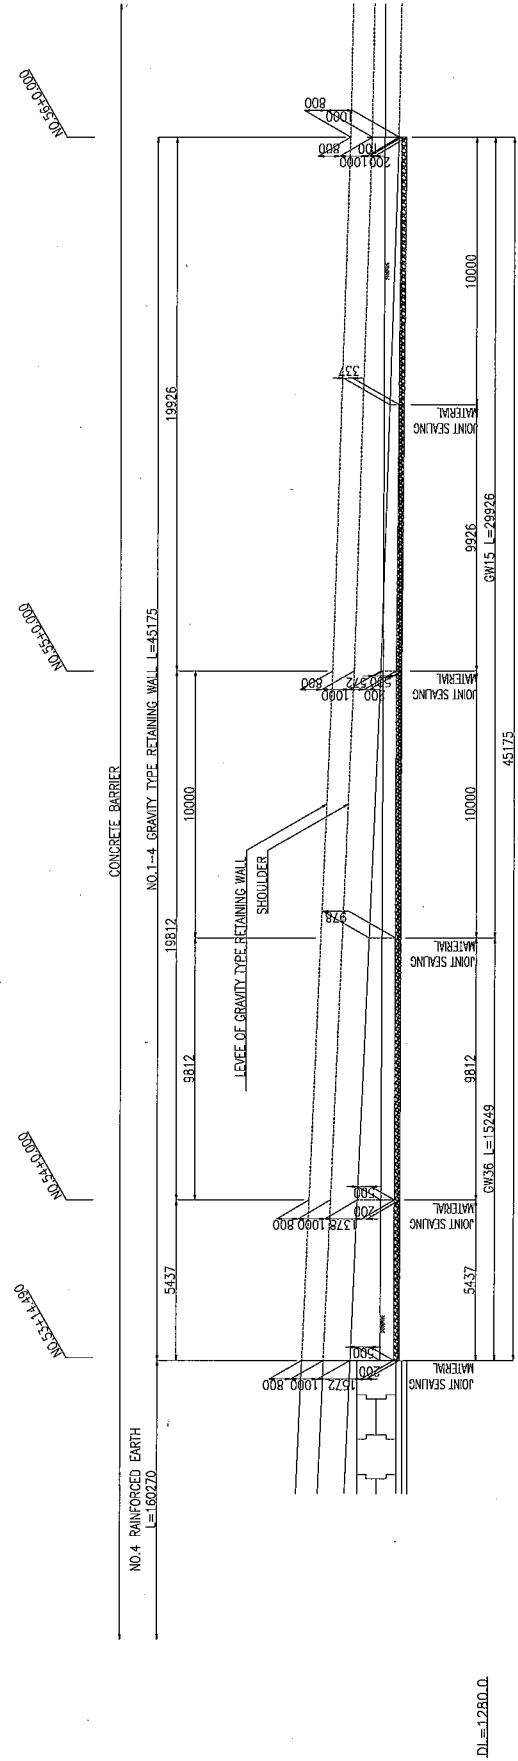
DETAIL OF GRAVITY TYPE RETAINING WALL (TYPE-1) (2/2)
